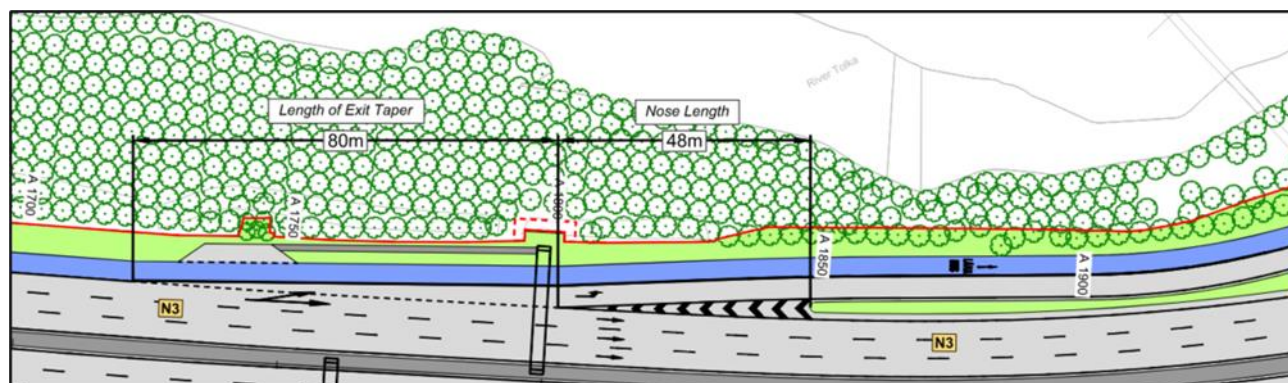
Proposed Diverge Layout on approach to James Connolly Hospital access road
